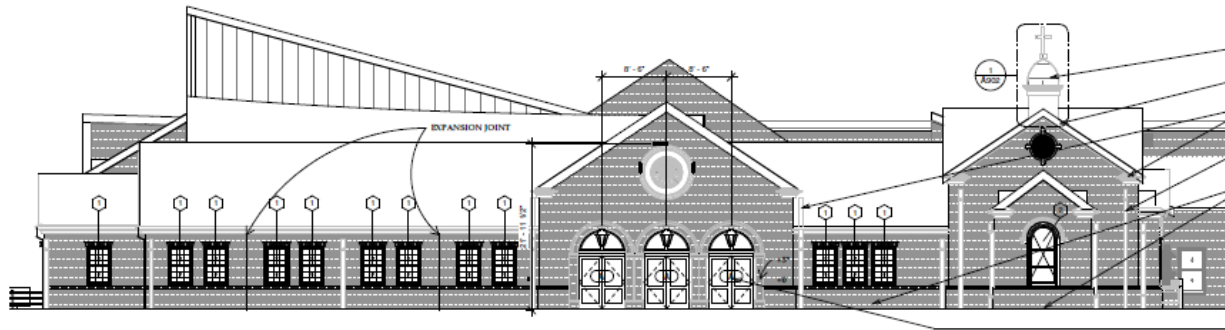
Proposed West Elevation for the Building Addition (outlined in red)
